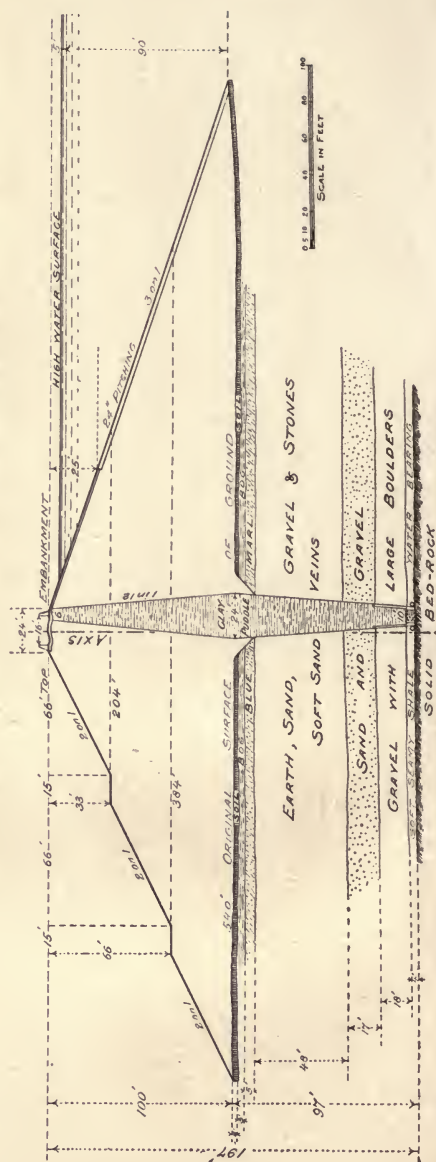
CROSS-SECTION OF YARROW DAM.
